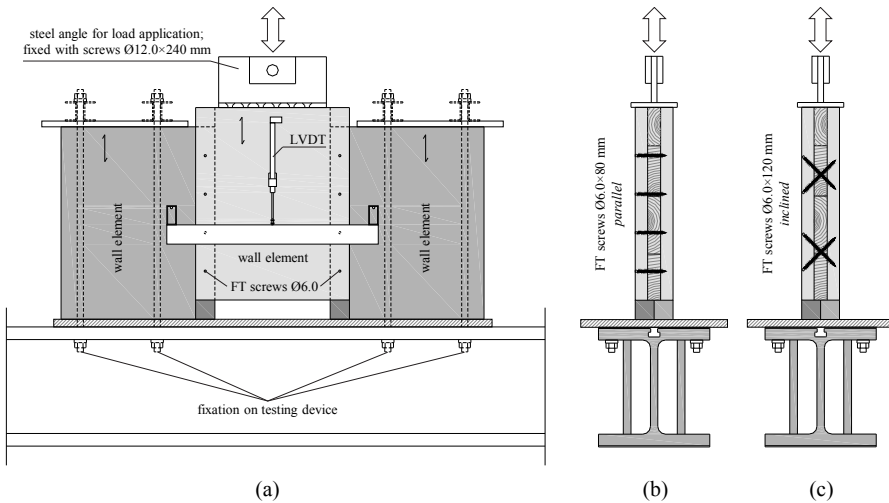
screwed joints connecting adjacent wall panels (vertical joint) – (a) general test set-up; (b) configuration with parallel screws; (c) configuration with inclined screws
